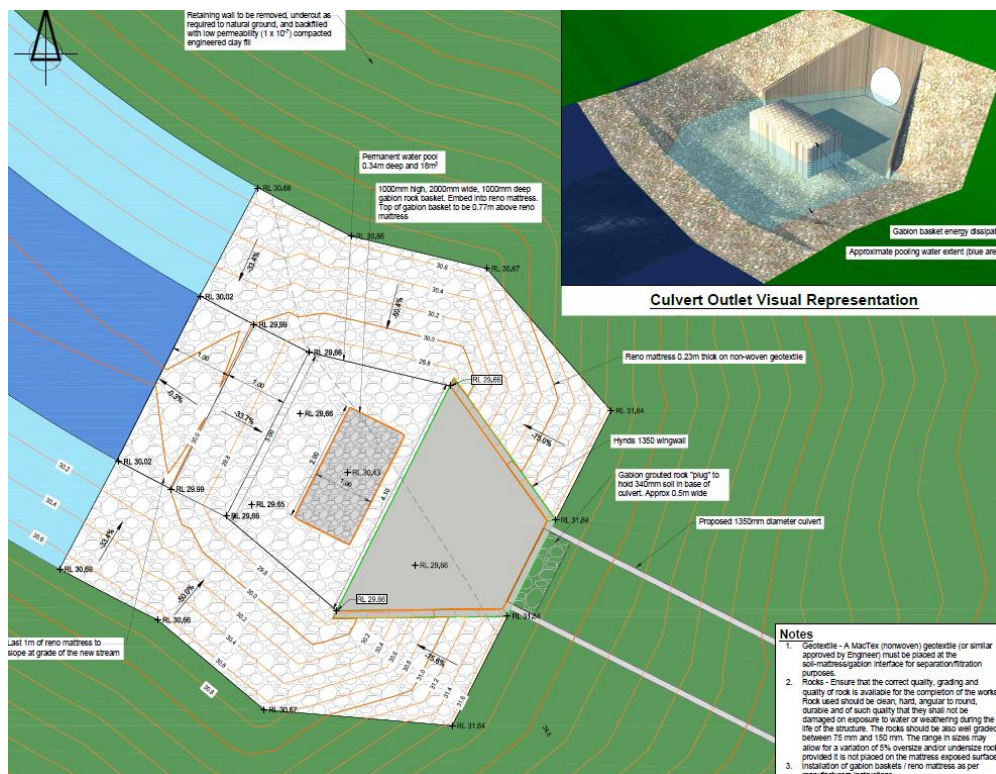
Proposed reno mattress and gabion rock walls at new culvert outlet, with permanent water pool
